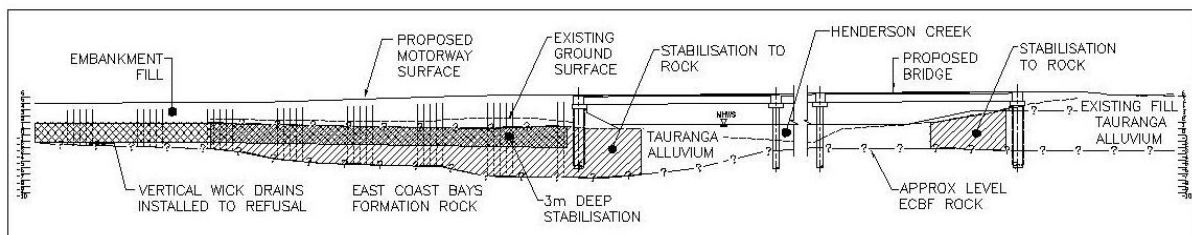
Geology and cross section of ground improvement at Henderson Creek Bridge.
